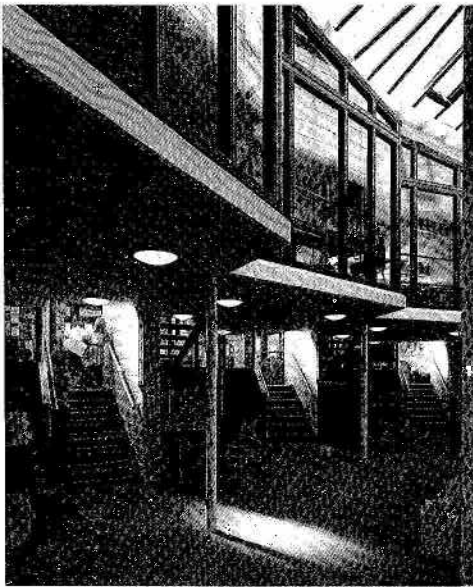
First floor slab supported on circular hollow sections (Credit: Joe Field & John Peck)
